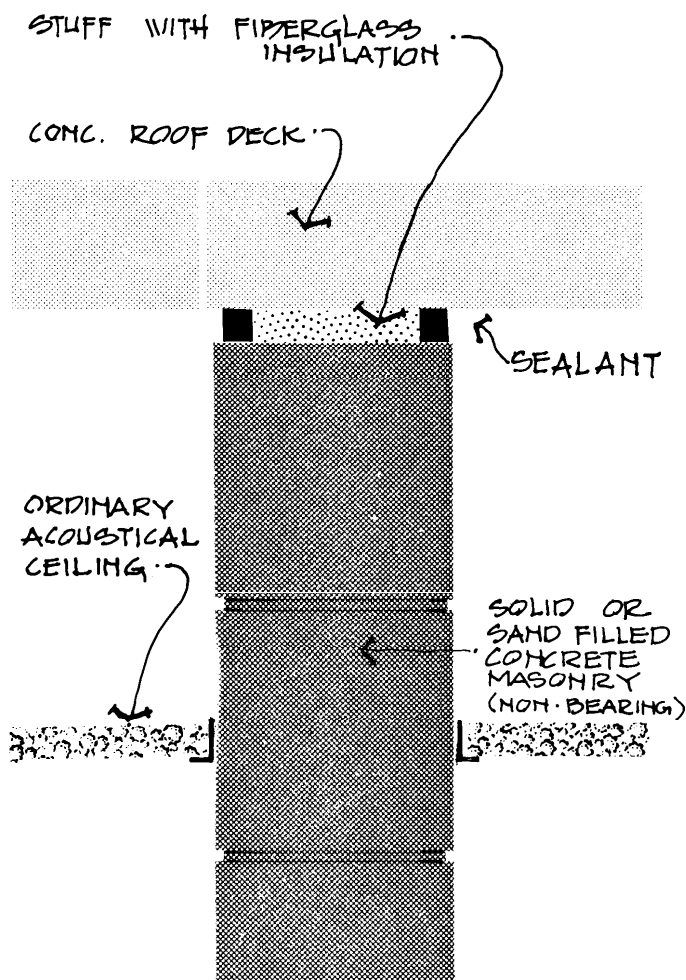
Minimum Wall Construction Required Between Individual Practice Rooms
